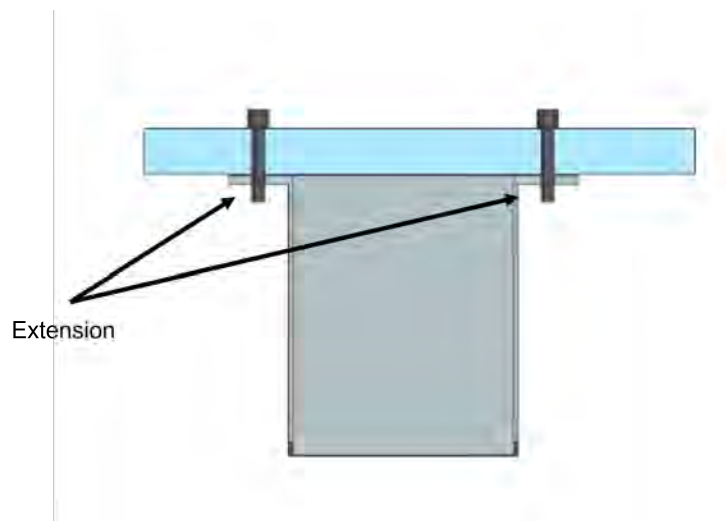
Beam and floor panel (blue) connected by bolts (black) and threaded aluminum extensions
